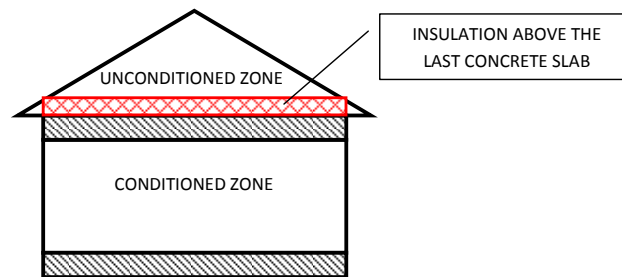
Insulation layer above the last concrete slab (Source: Boneta et al., 2013)
